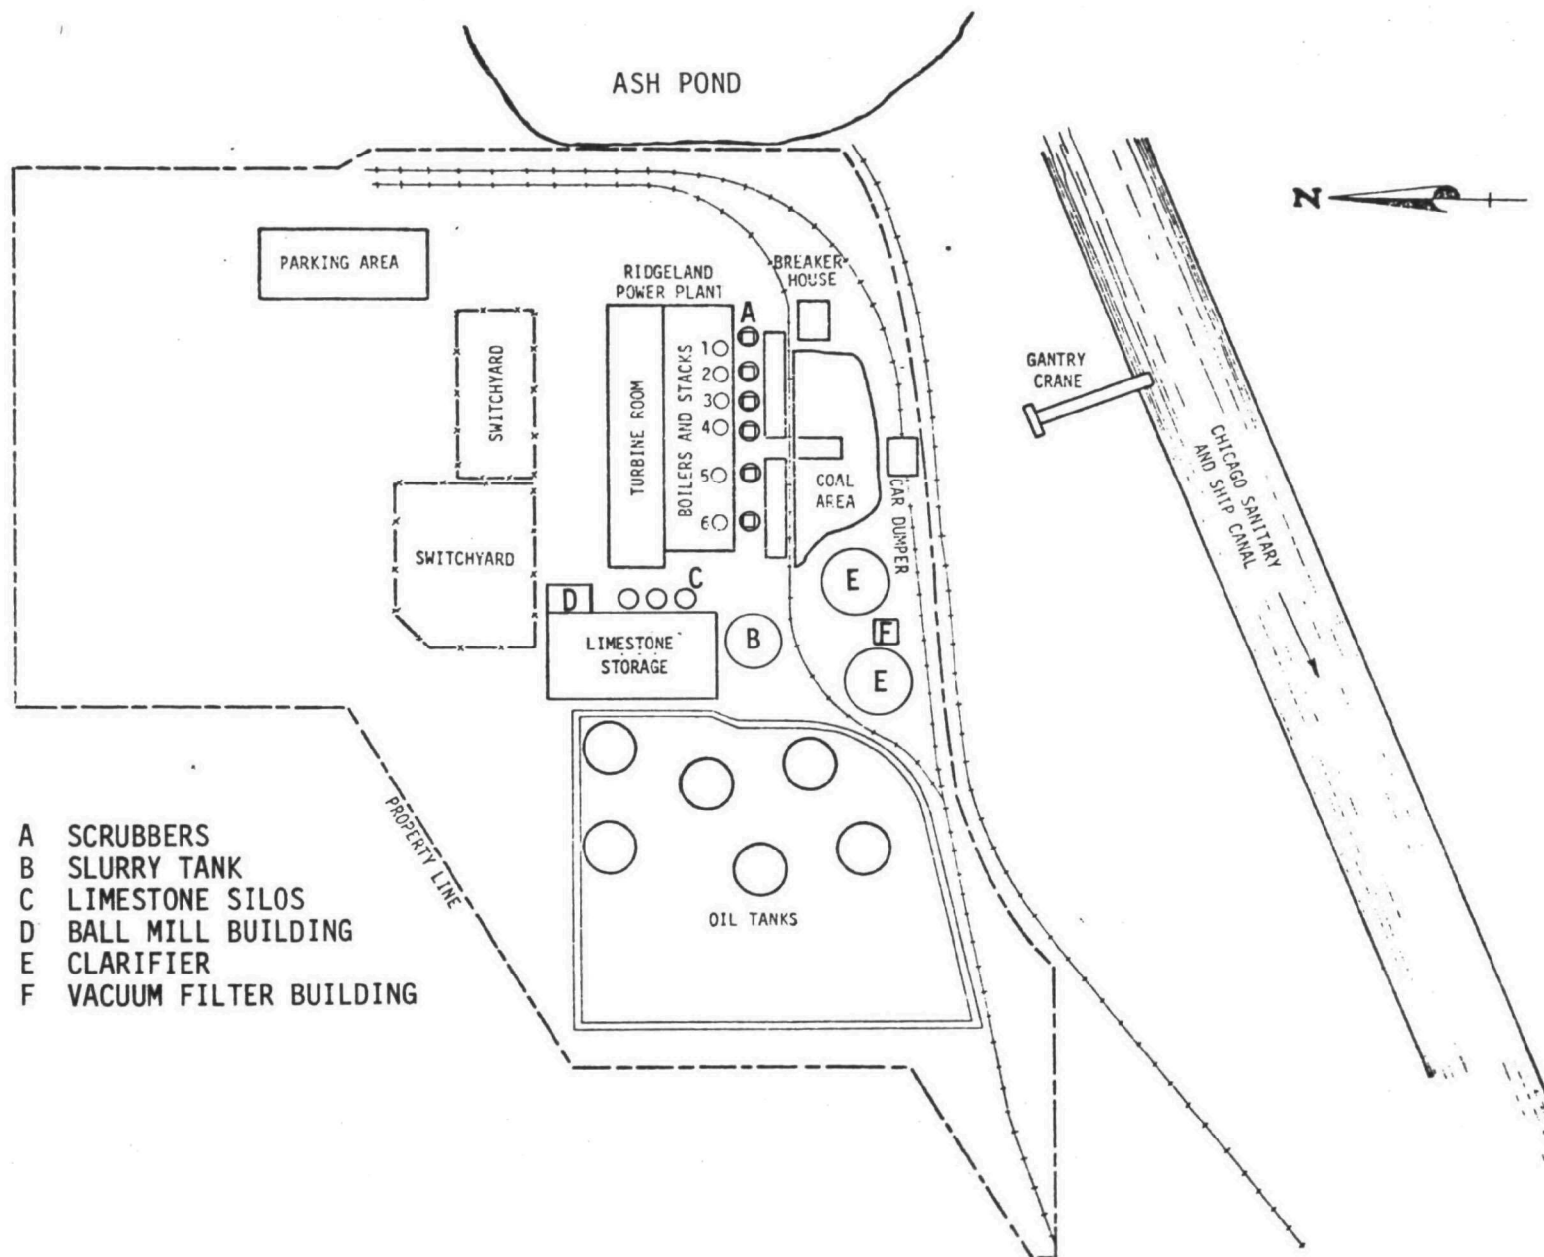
Site plan showing possible location of major components for the limestone system for Boilers 1,2,3,4,5, and 6 at the Ridgeland power plant.
